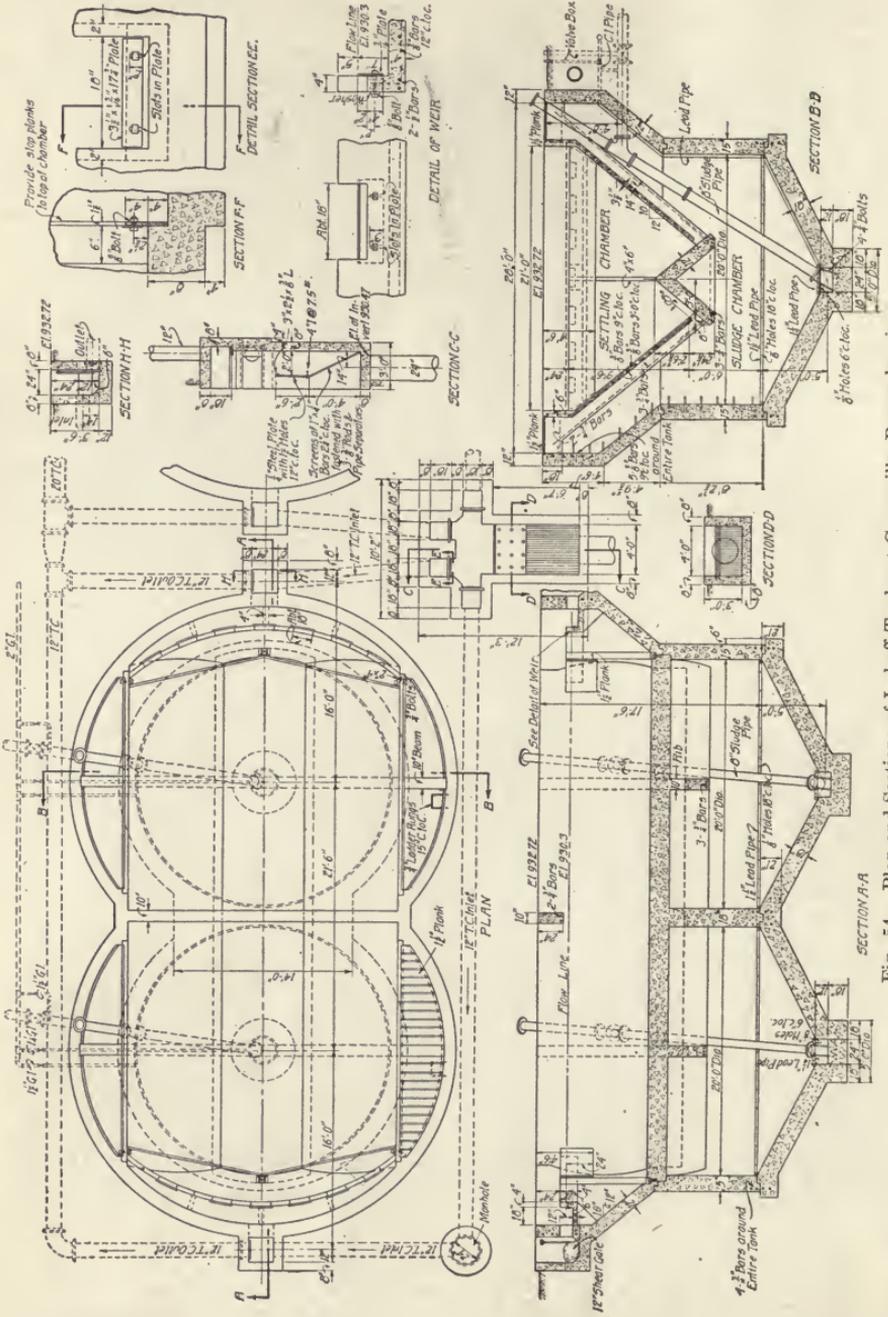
Plan and Sections of Imhoff Tanks at Greenville, Pennsylvania
